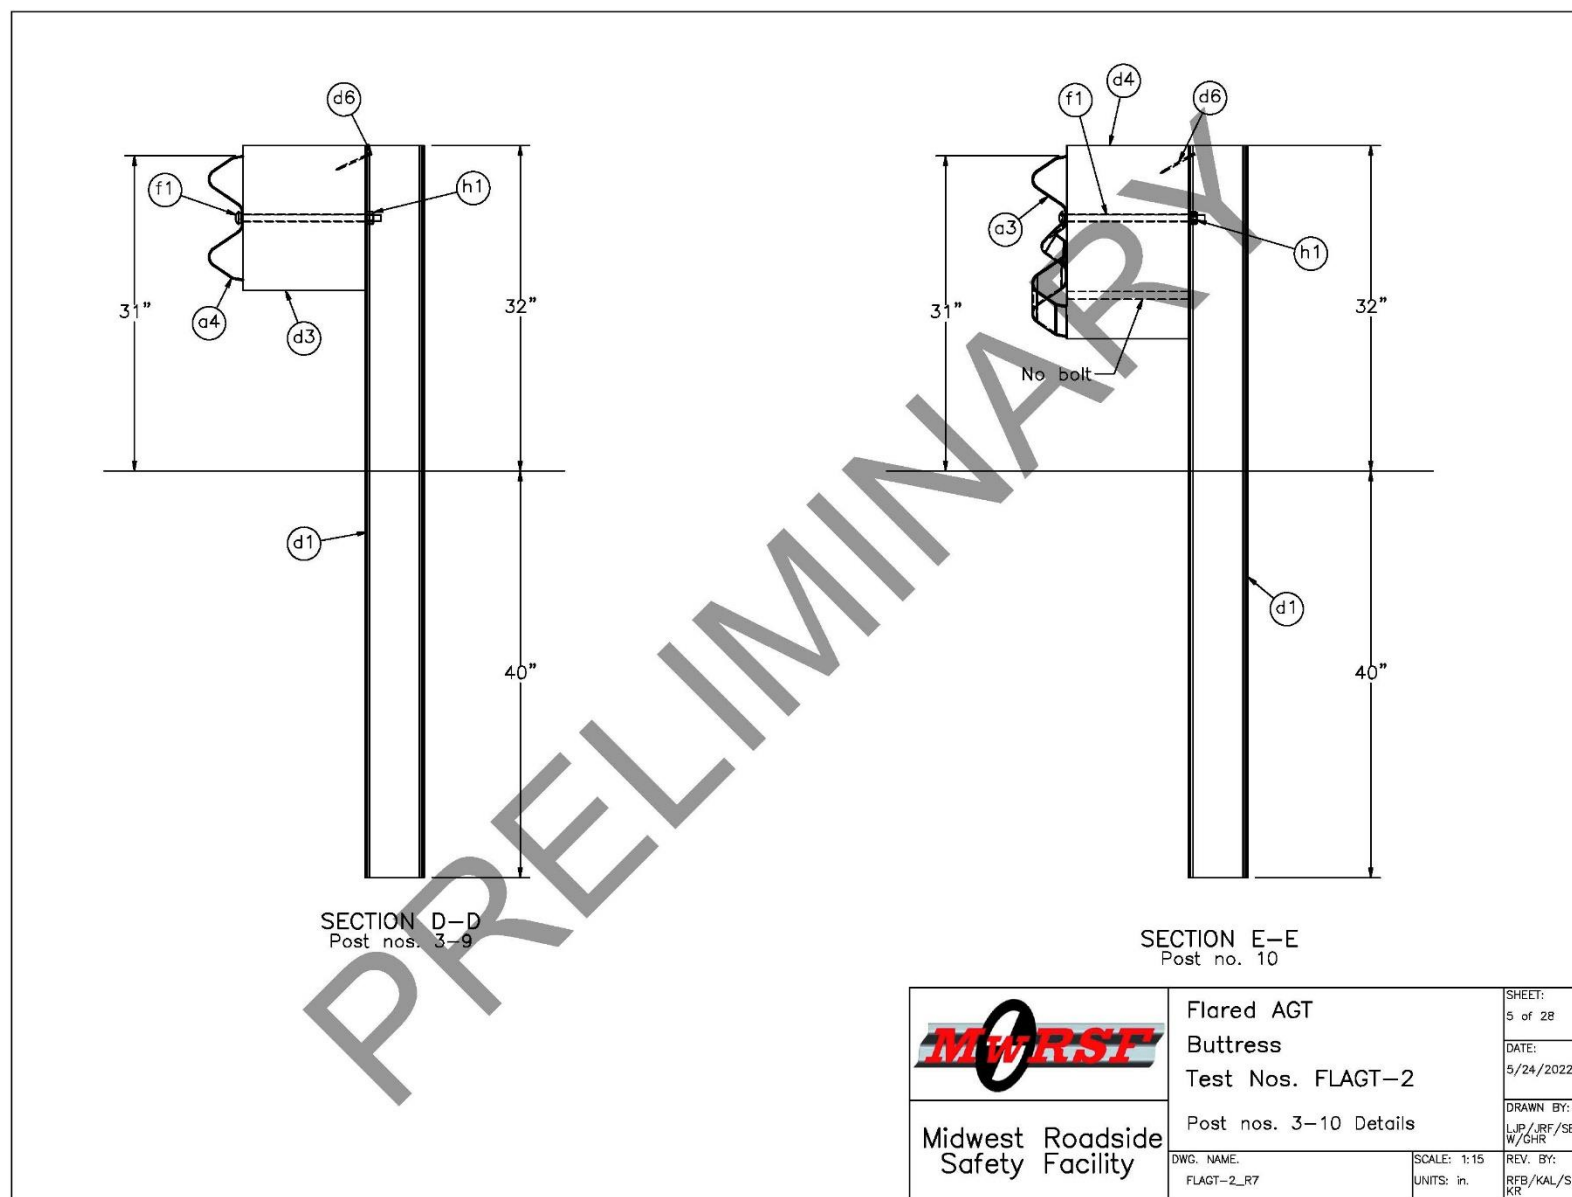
Post Nos. 3 through 10 Details, Test No. FLAGT-2
